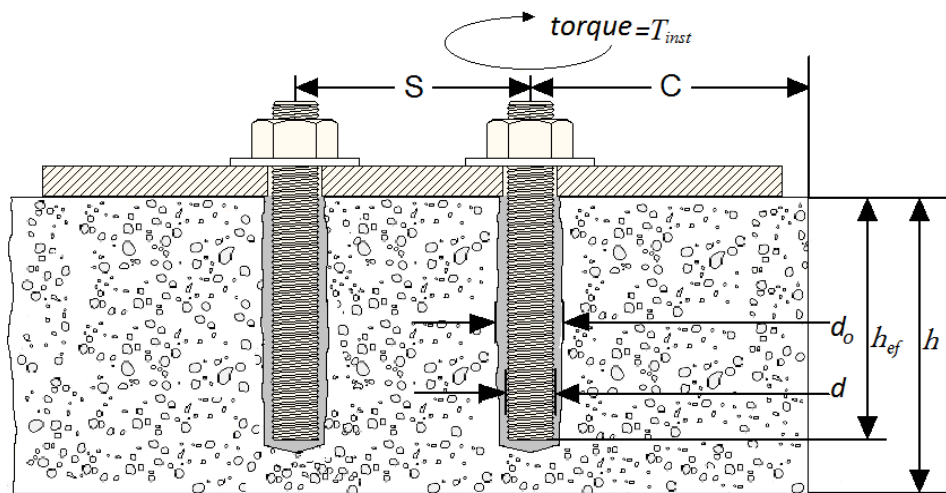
TYPICAL INSTALLATION DETAIL FOR THREADED RODS AND REINFORCING BARS
